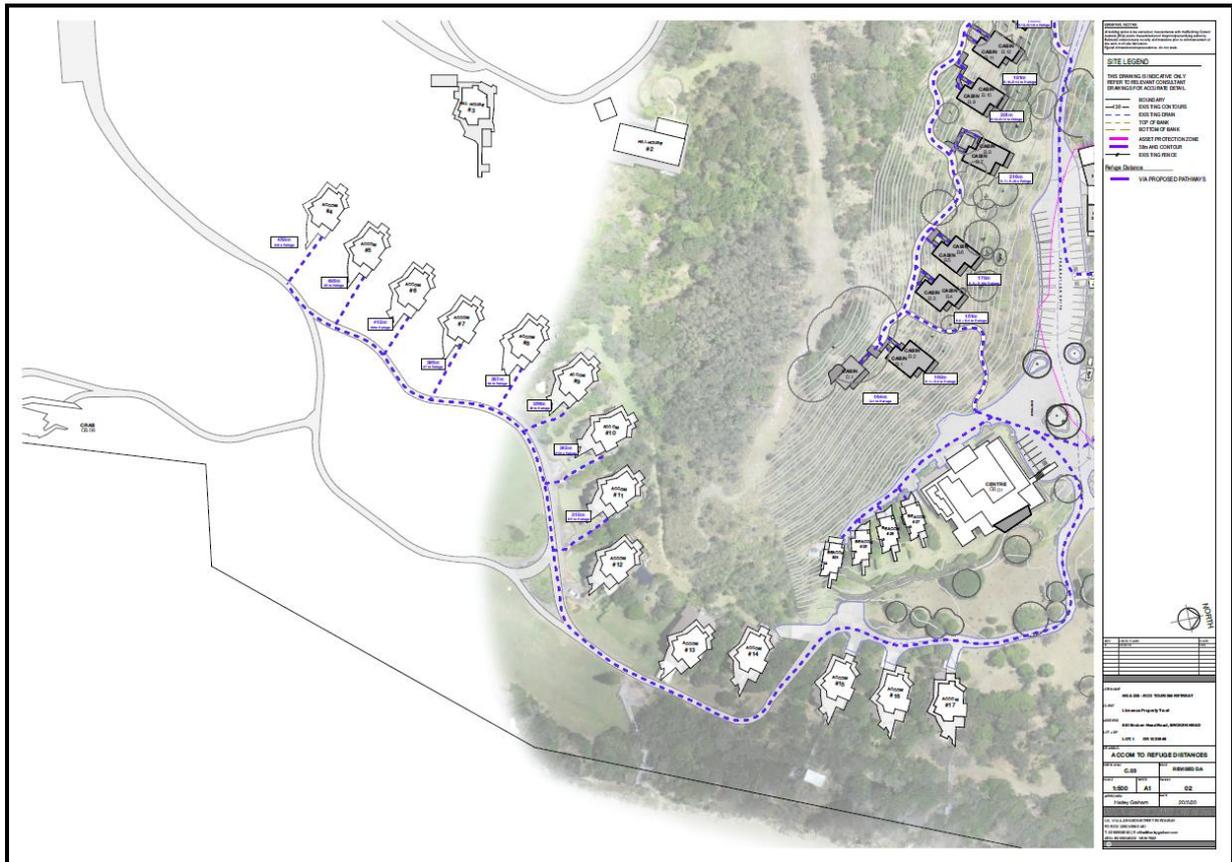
Access from the existing cabins (subject to change of use) along the existing roadway to the refuge building. Existing dwelling No. 3 route not shown.
